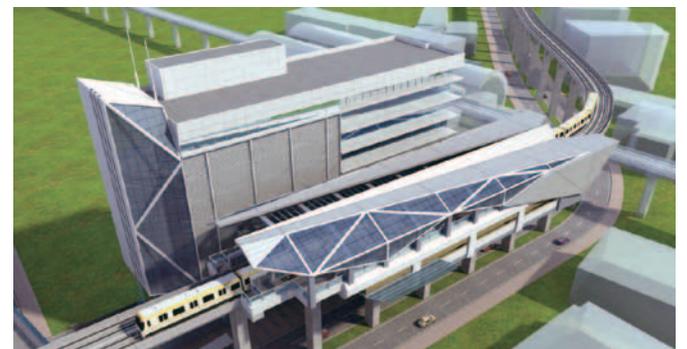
Plan Drawing of Elevated MRT Station and Entrance
